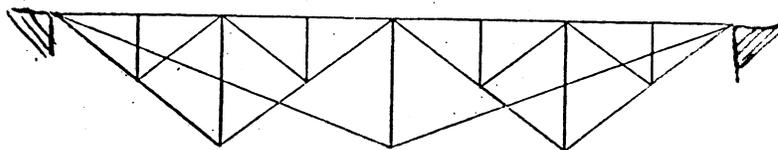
Albert Fink's suspended truss patented in 1854. (From Bridge Engineering, James A. L. Waddell, p. 473.)
